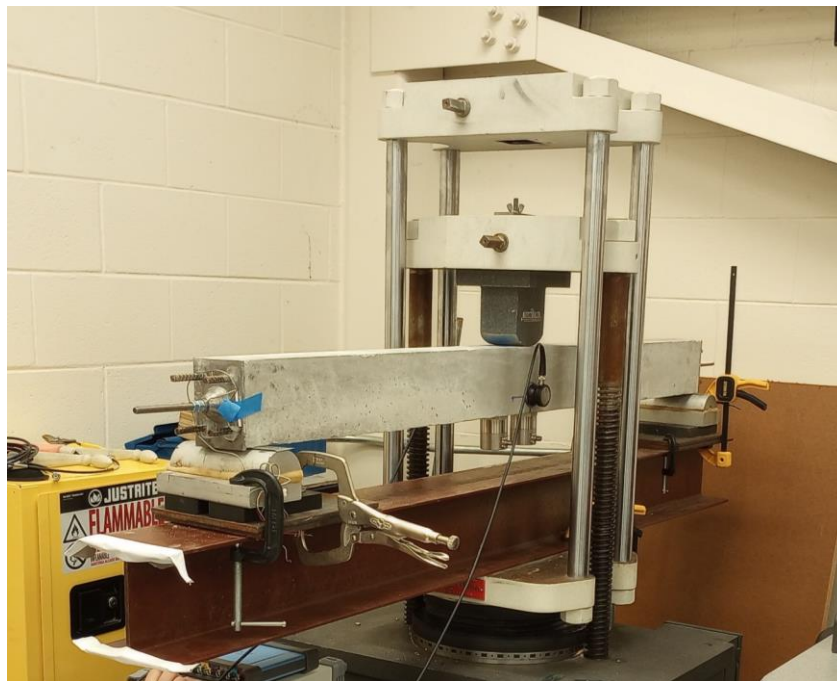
Image showing the 3-point load testing frame and the Tinus and Olsen universal testing machine
